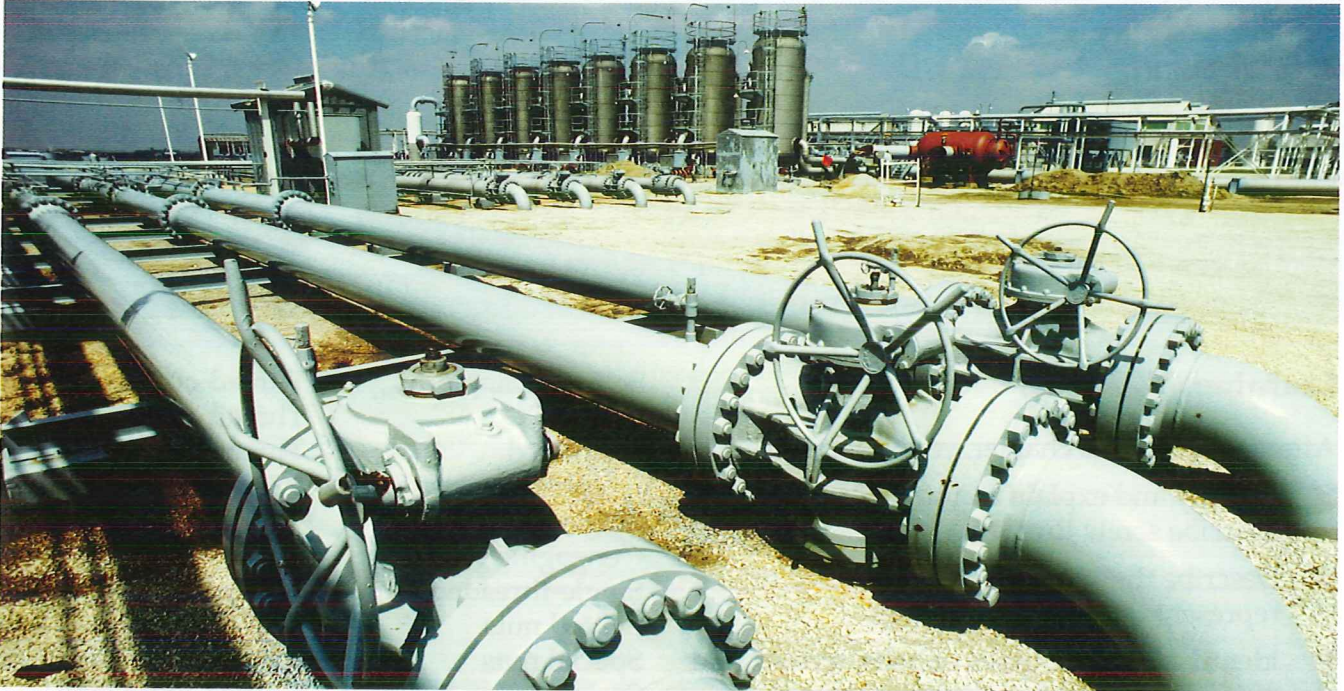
Many industrial assemblies require fasteners. The types of fasteners selected must suit the needs of a particular manufacturing or construction application.
